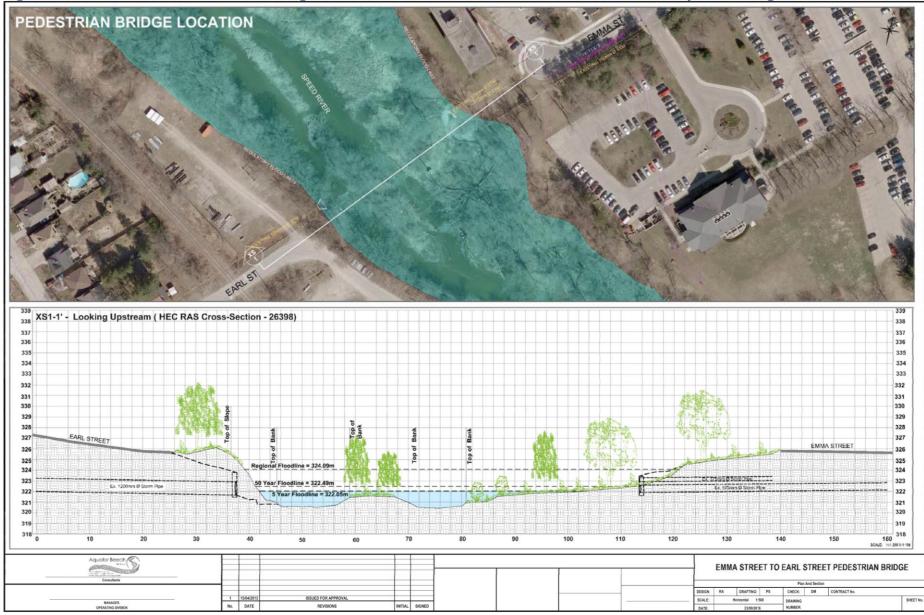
Plan & Cross Section Showing HEC-RAS Floodlines and W.S Elevations at the Proposed Bridge Location
